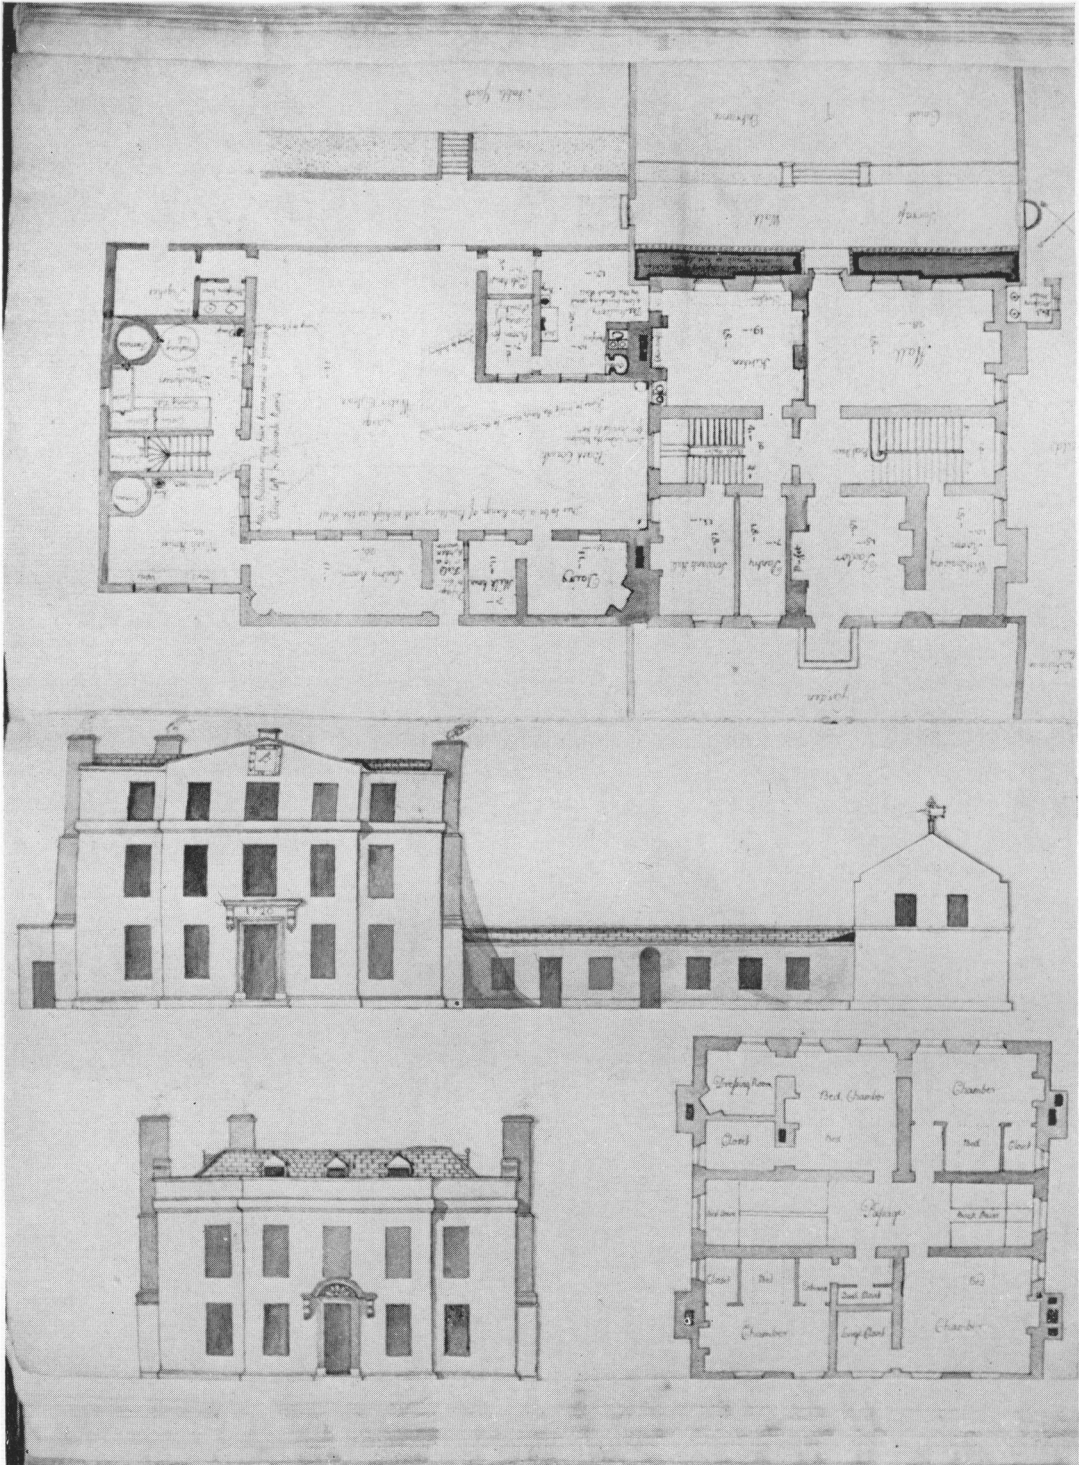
Plans and two elevations of a farmhouse, 1720 [44, 45]
